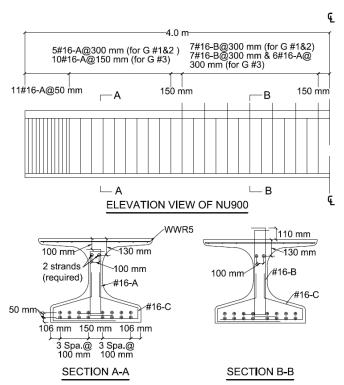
NU900 [NU35] girder specimen reinforcement [1 mm = 0.0394 in.]
